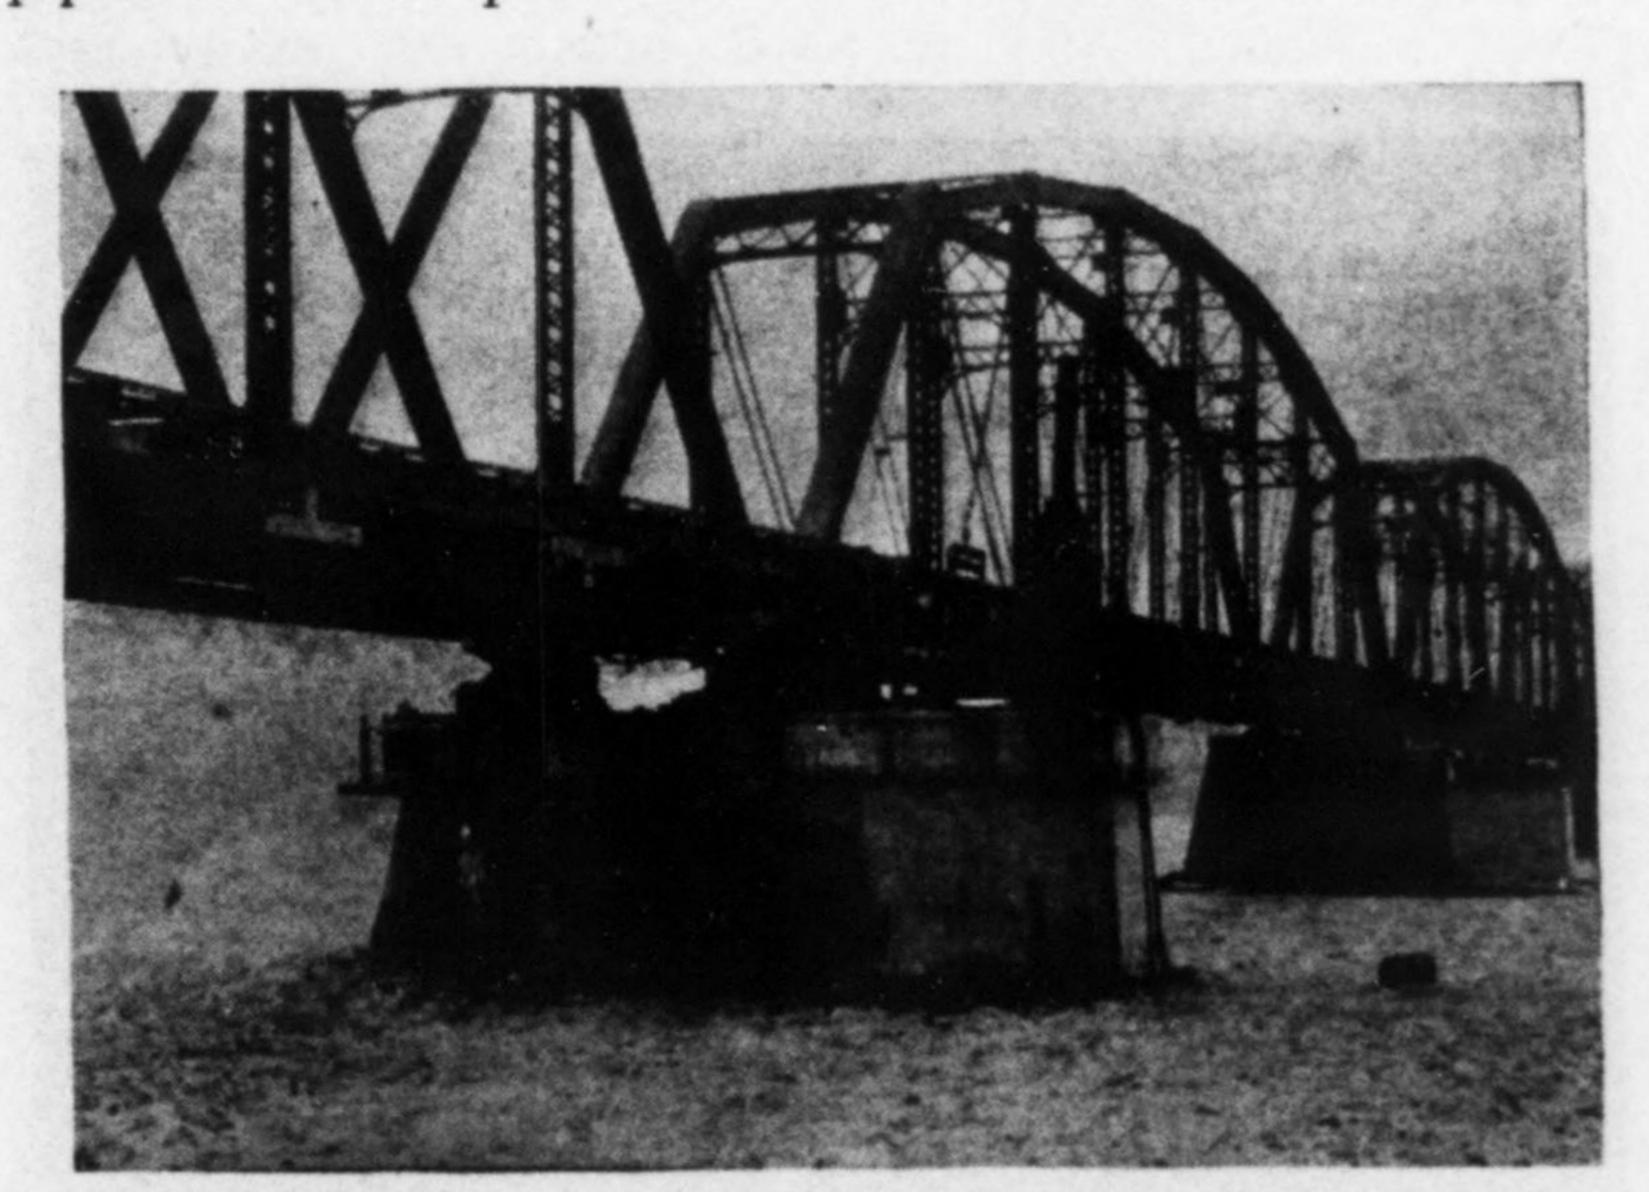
RESULT OF STEAMER COLLISION WITH BRIDGE PIER
